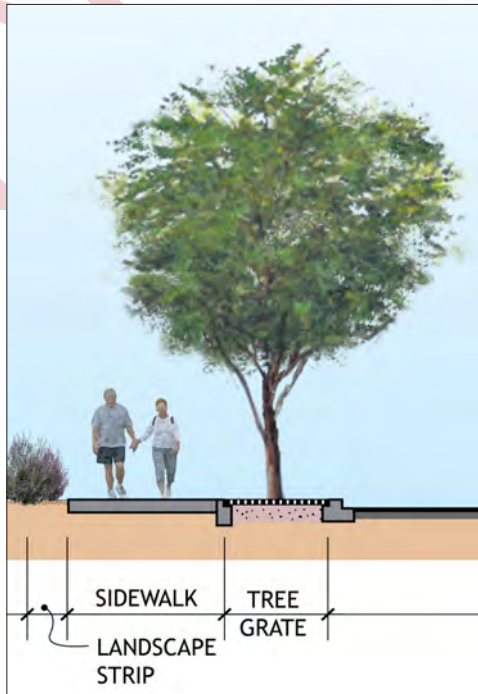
o: TYPE 5 - Landscape strip with sidewalk and trees in grates.
